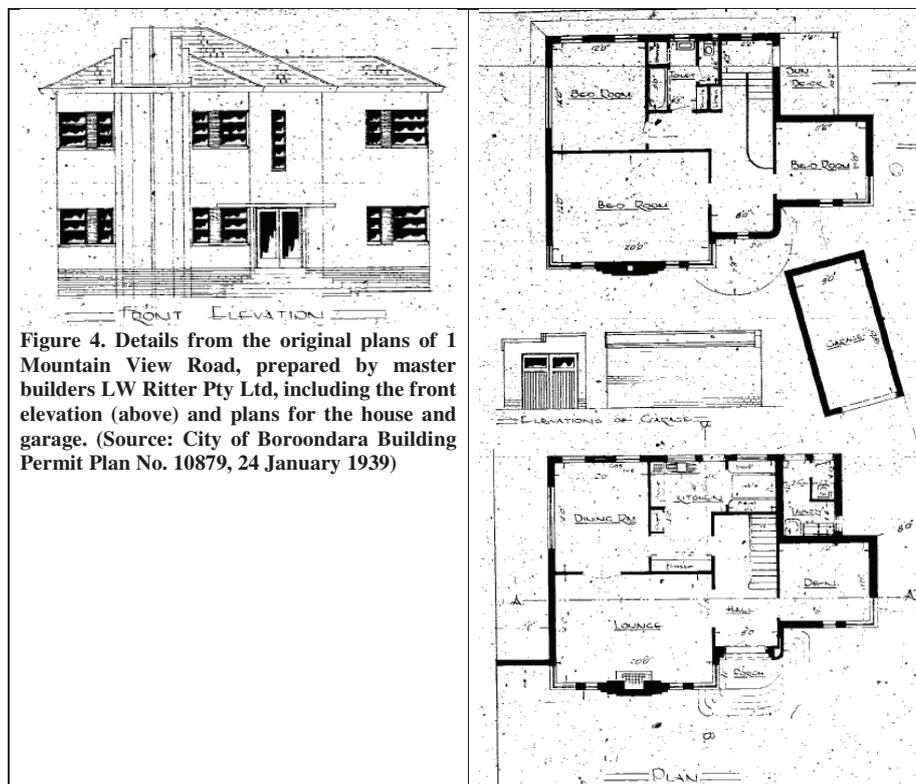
Details from the original plans of 1 Mountain View Road, prepared by master builders LW Ritter Pty Ltd, including the front elevation (above) and plans for the house and garage. (Source: City of Boroondara Building Permit Plan No. 10879, 24 January 1939)
